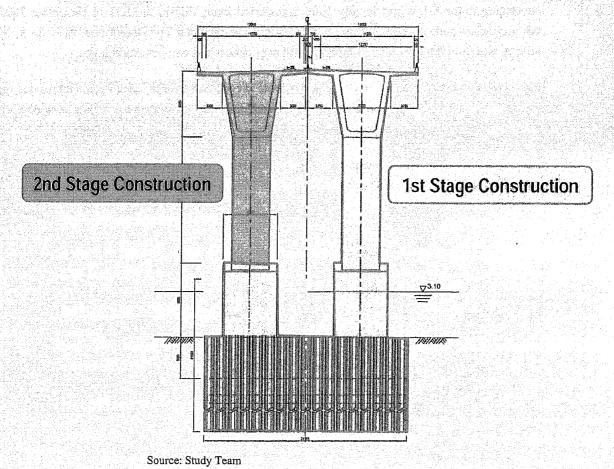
Typical Cross Section of Main Bridge (Stage Construction)
